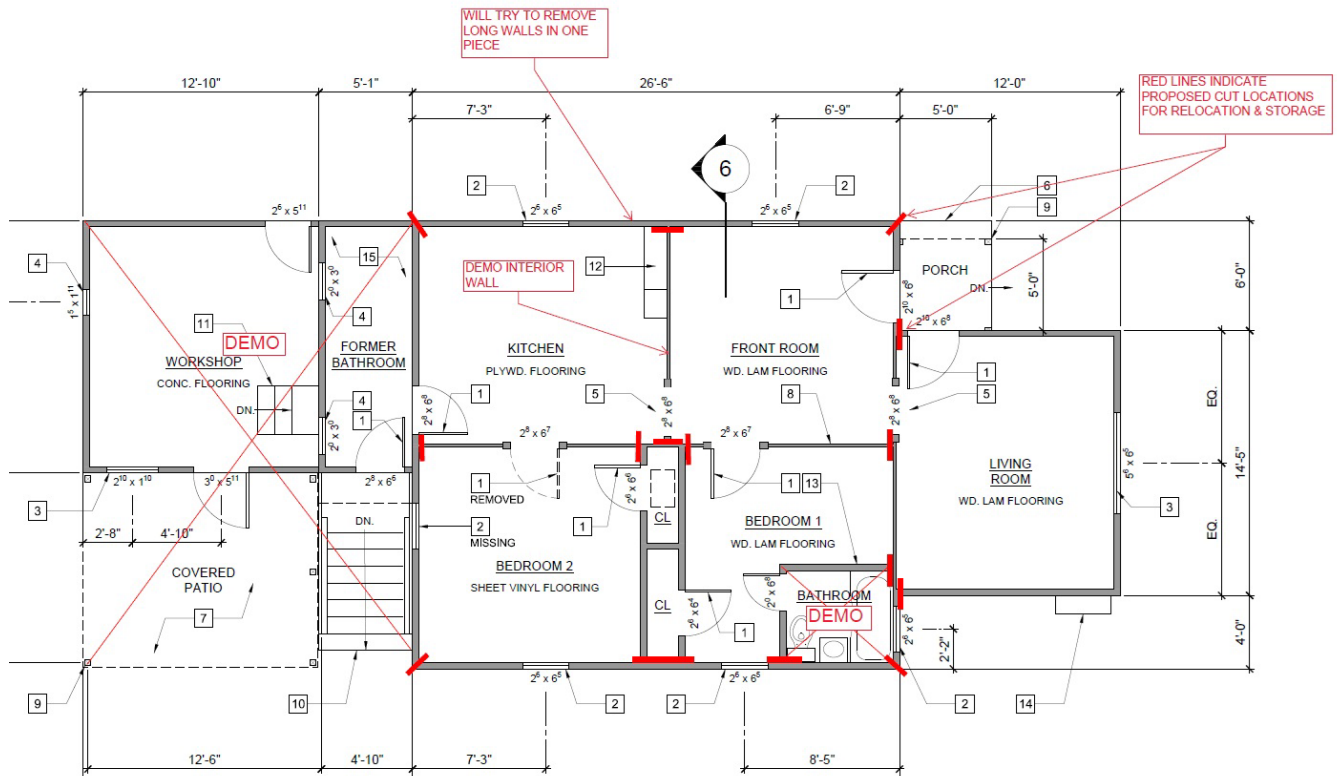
Floor plan showing the proposed cuts to dismantle the house for relocation.
